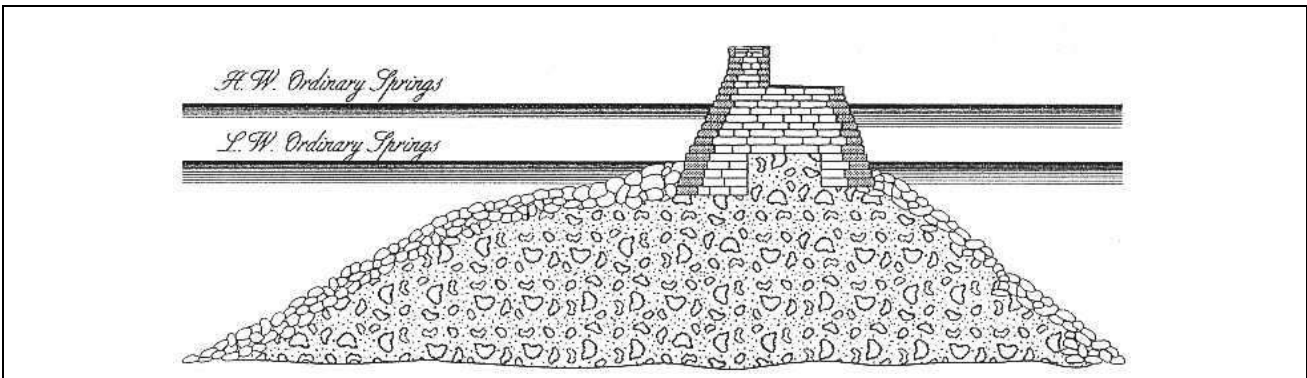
Simplified section of outer length of Alderney breakwater mound and wall, showing extended mound
